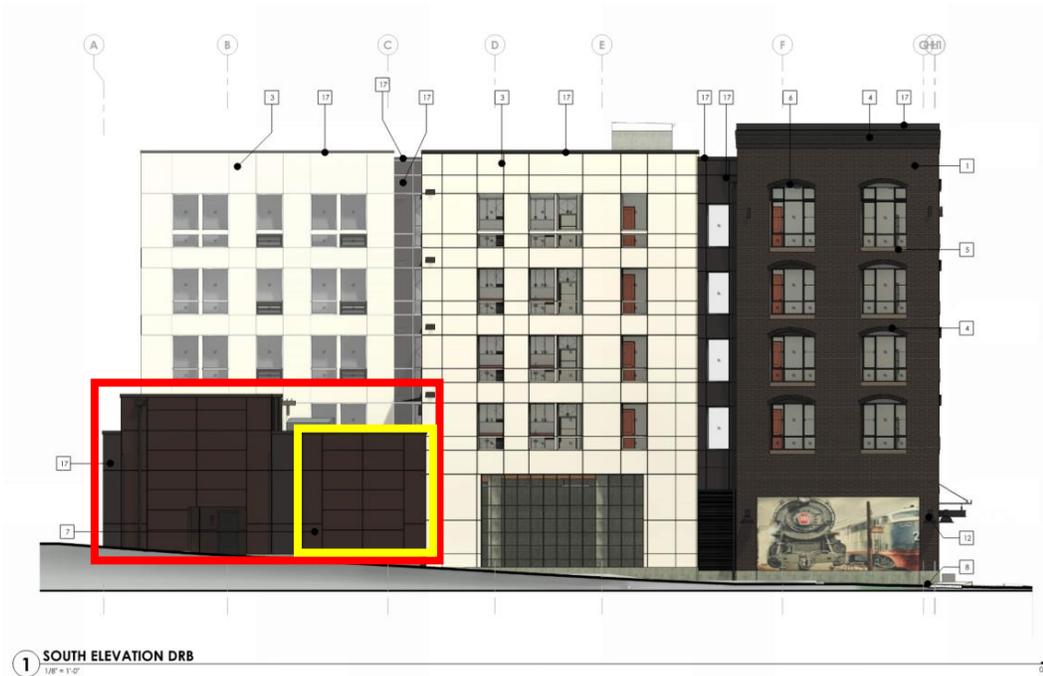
Southern façade of the building with areas highlighted for Board review. Staff suggests requiring brick in the red area and additional blank wall treatment in the yellow area.
